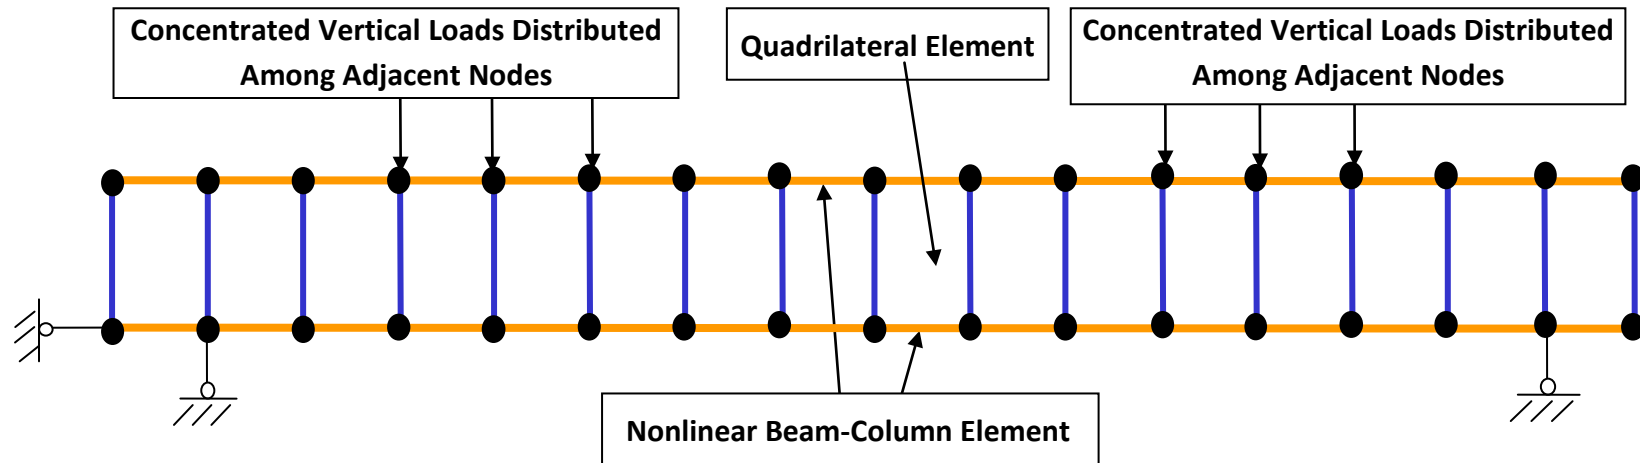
Finite Element Mesh of Girder Specimen F4
